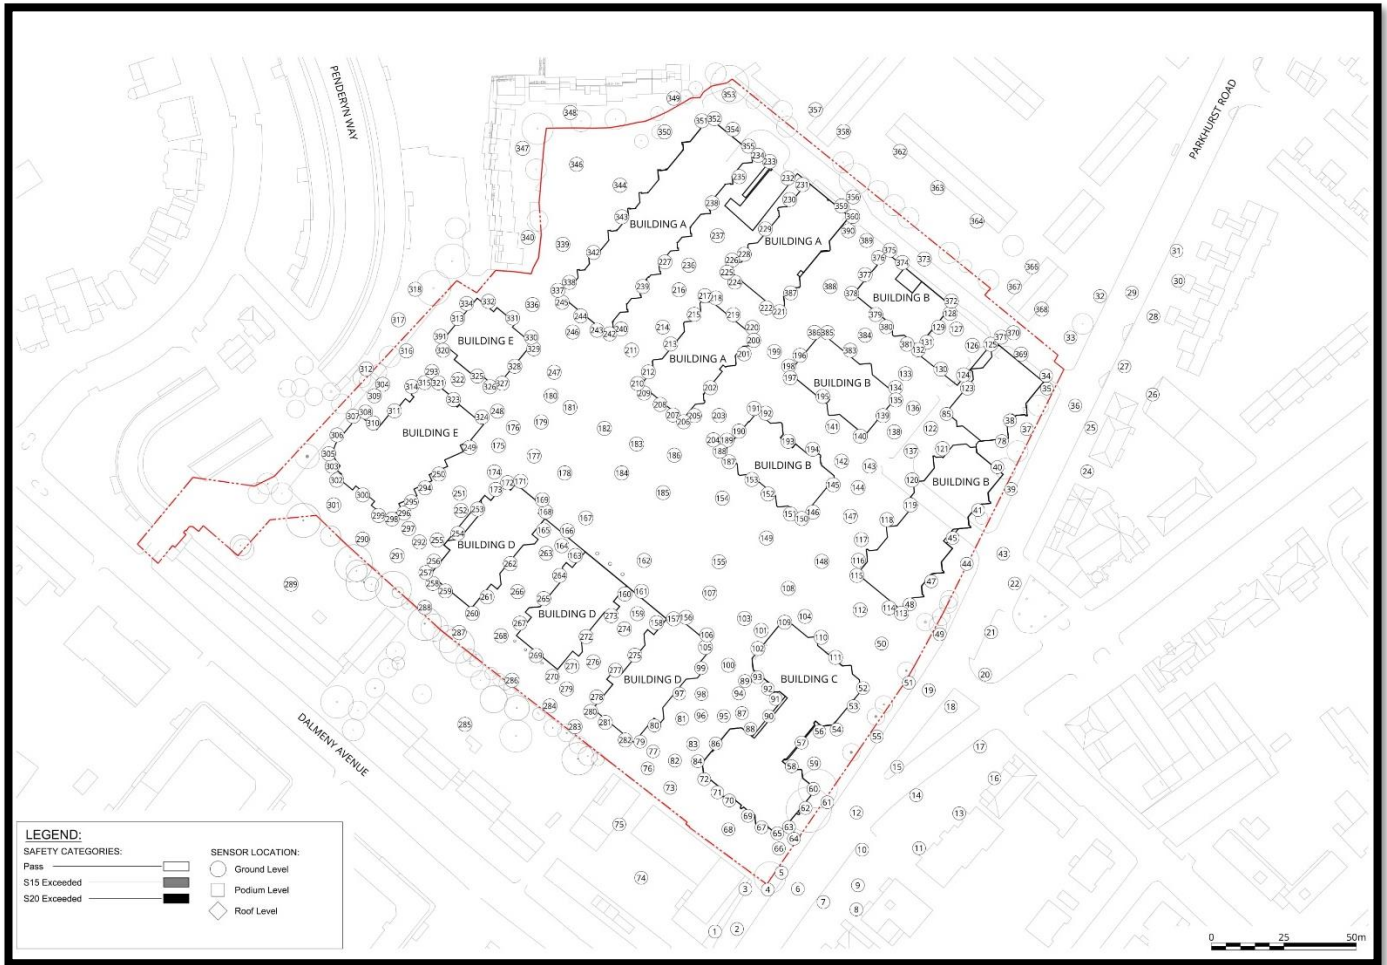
Configuration 2 - The Development with Existing Landscaping and Existing Surrounding Buildings Elevated Levels - Summer Season
